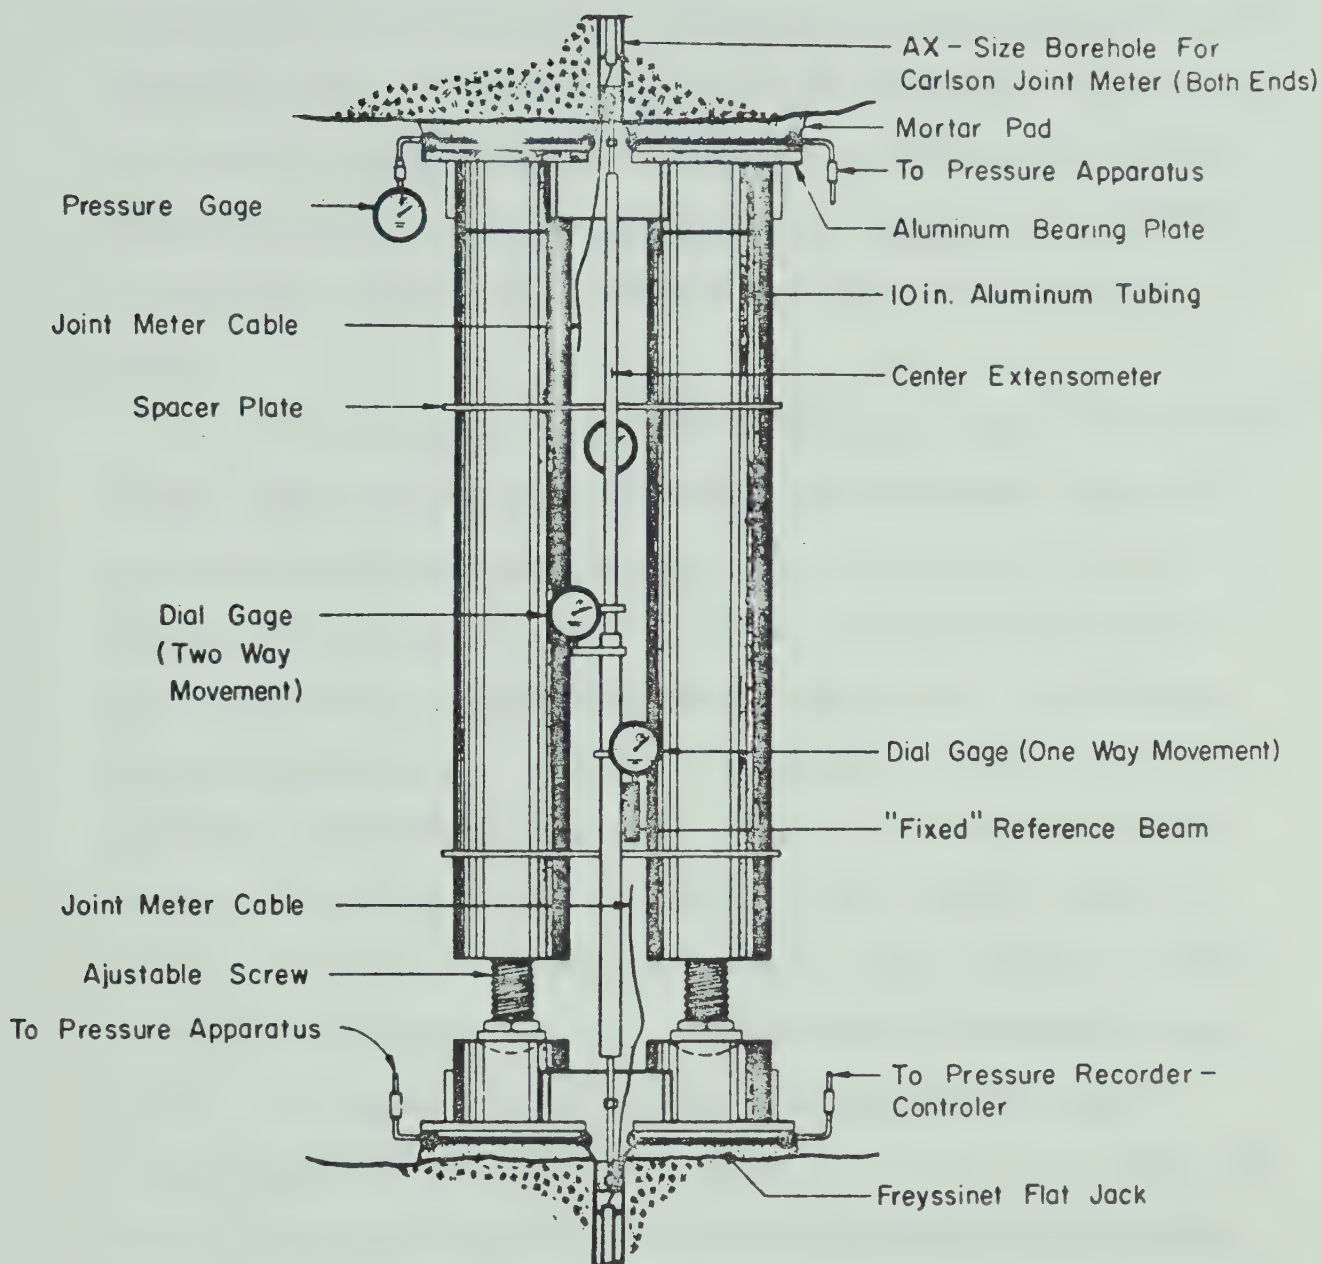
DWORSHAK DAM PLATE JACKING TEST (AFTER SHANNON AND WILSON, 1964) (FROM DEERE ET AL., 1969)
